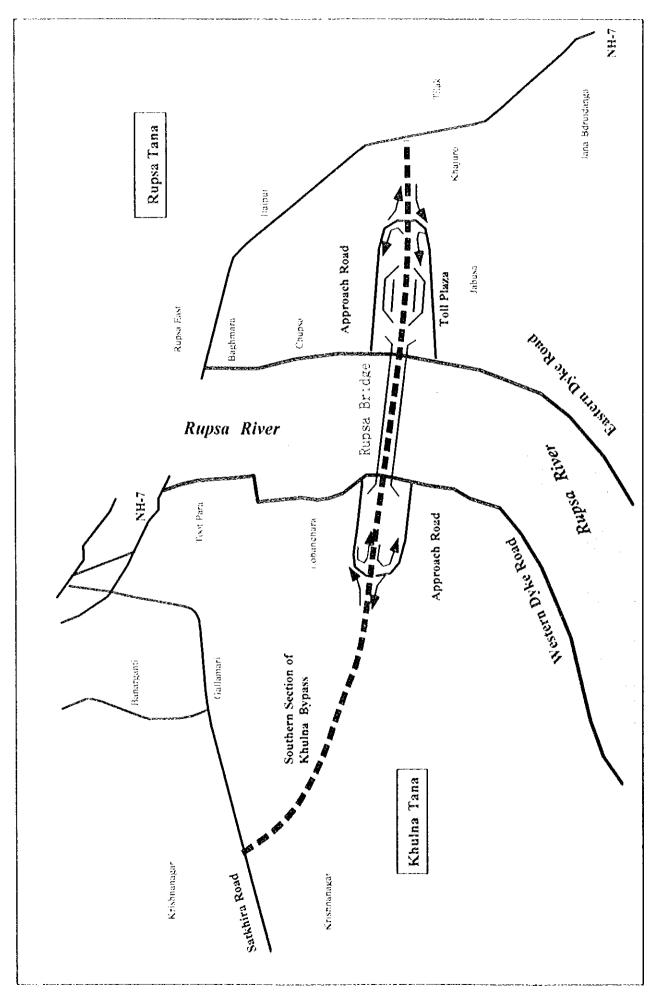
Location of Toll Plaza and Service Roads to Connect with Dyke Roads
